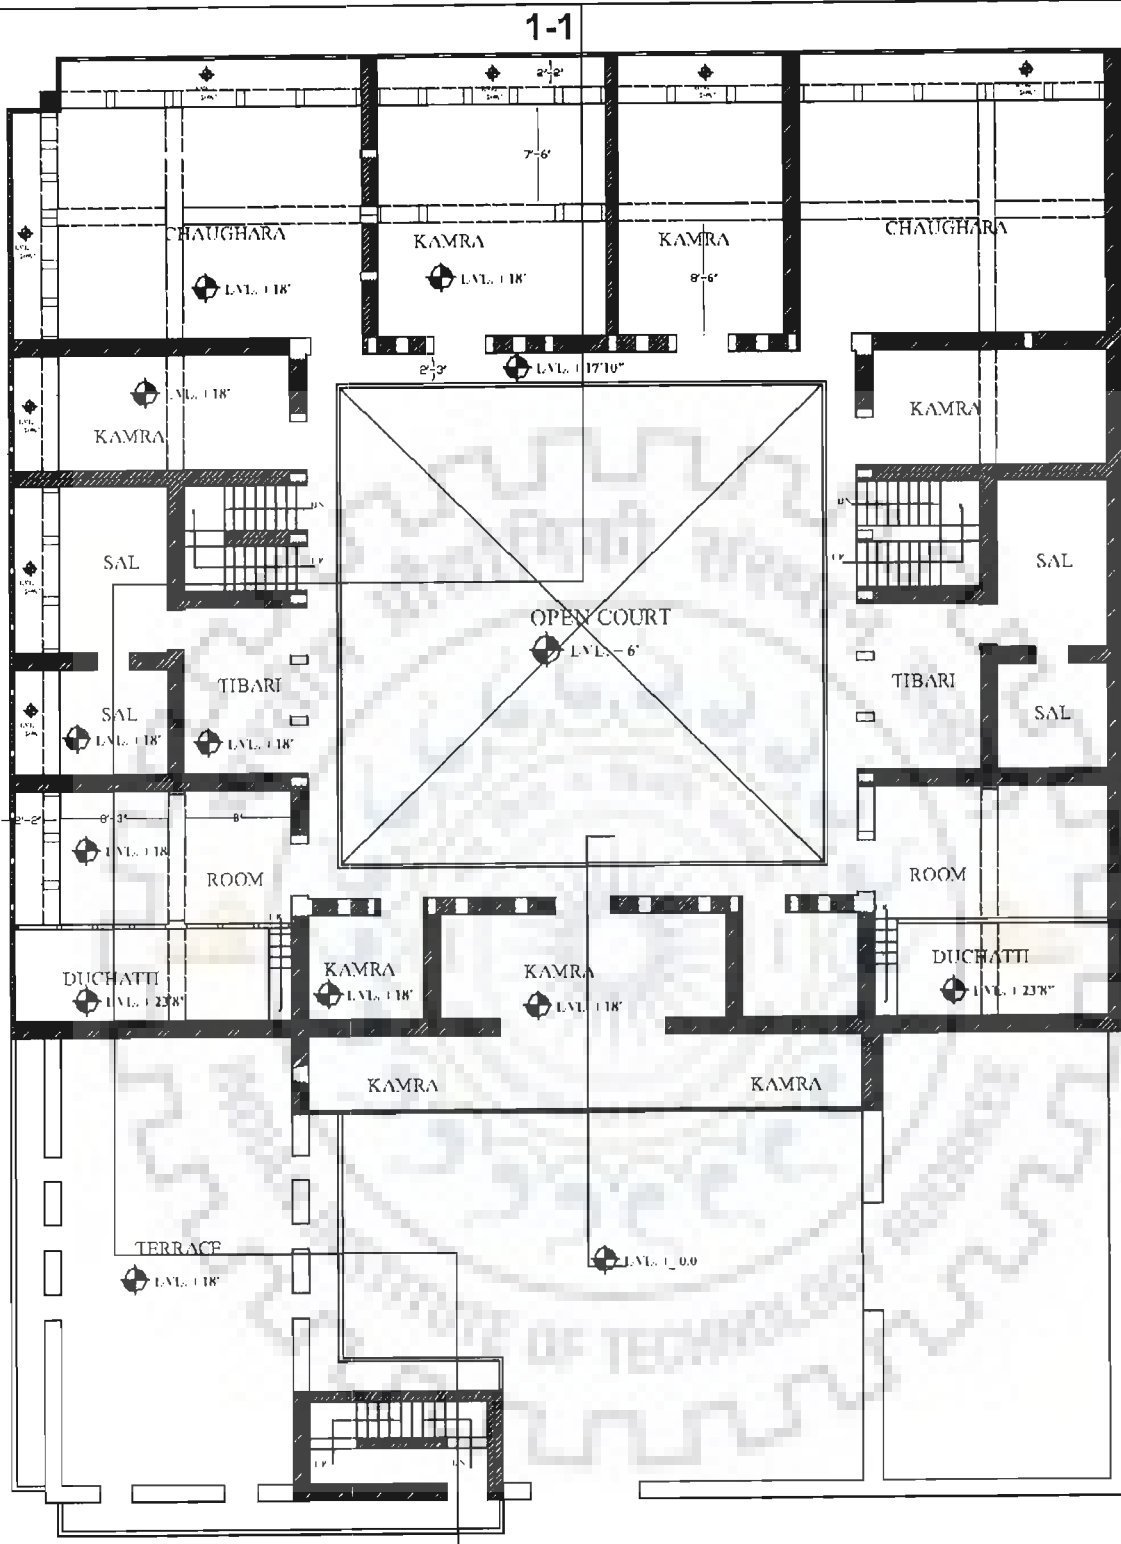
Mezzanine Floor Plan for Upper Ground Level
